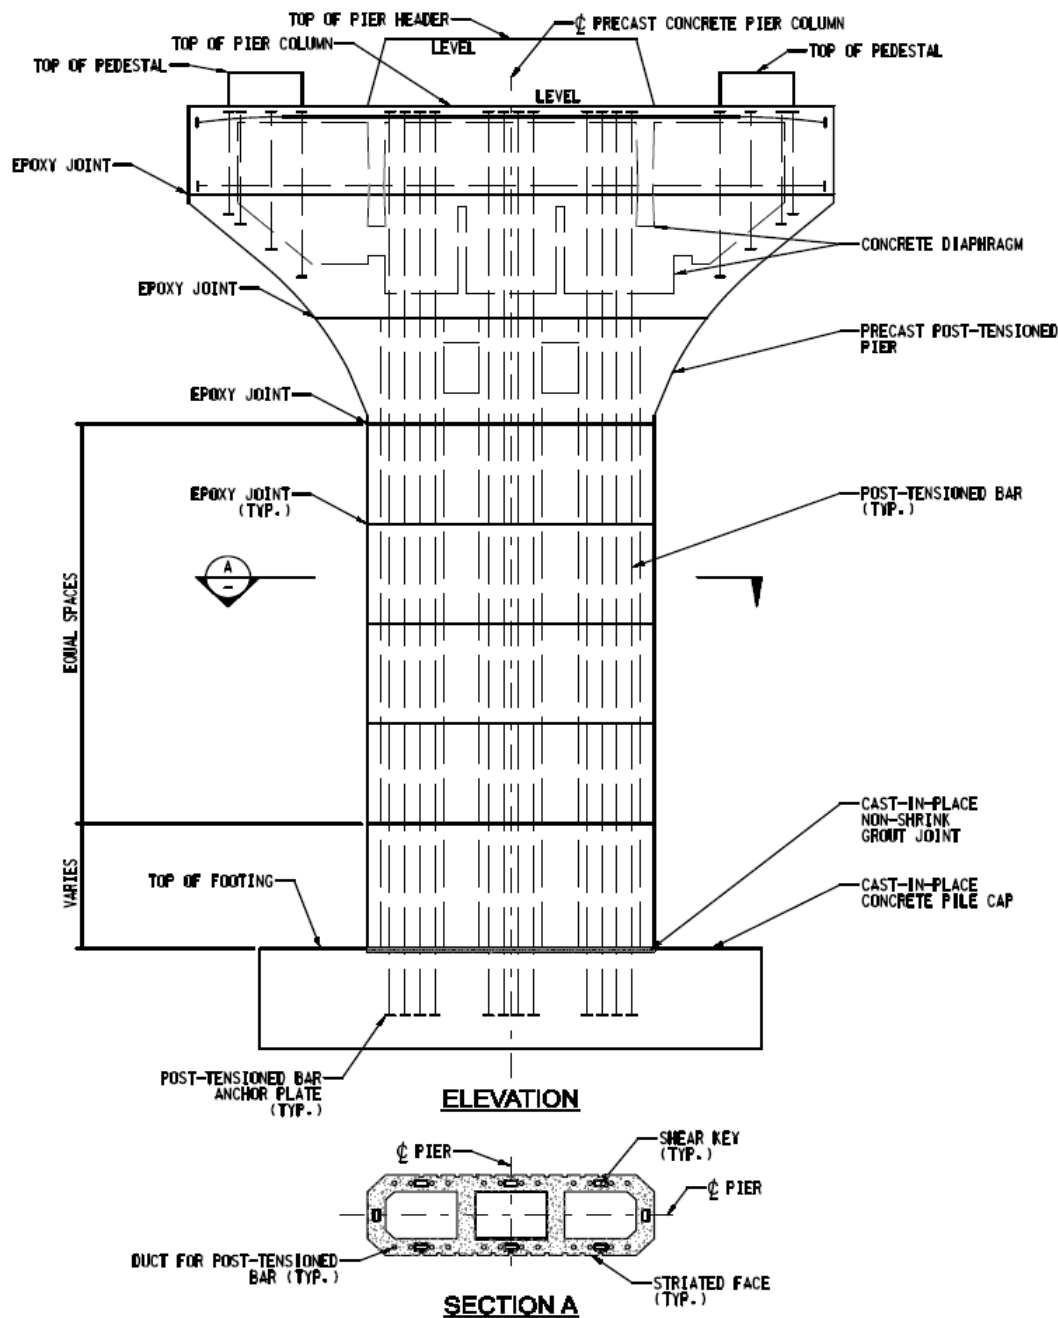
Connection of Pier Wall to Pier Wall [U5]
